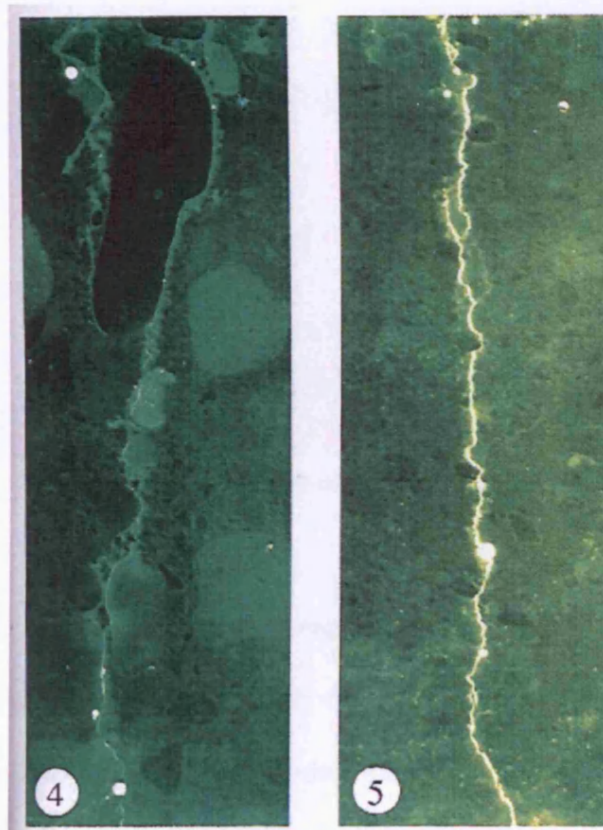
Formation of cracks in concrete (van Mier 1997)
